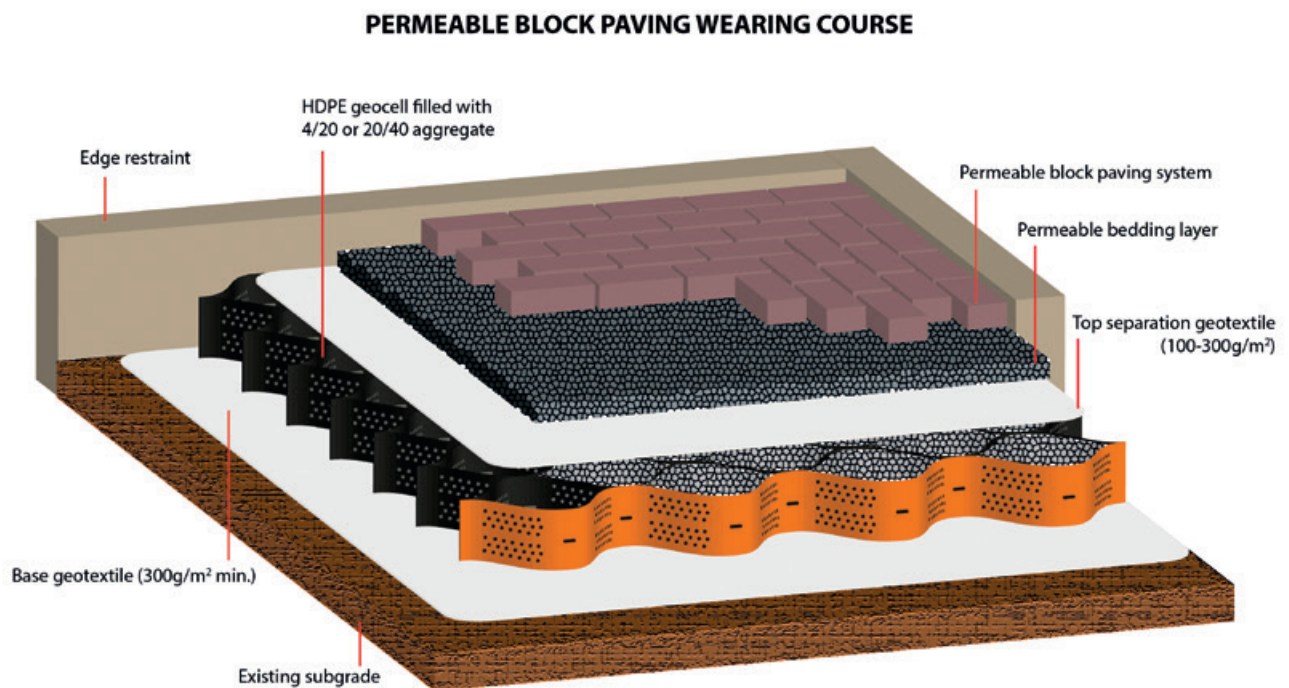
The recommended specification when installing permeable block paving above a cellular confinement system
